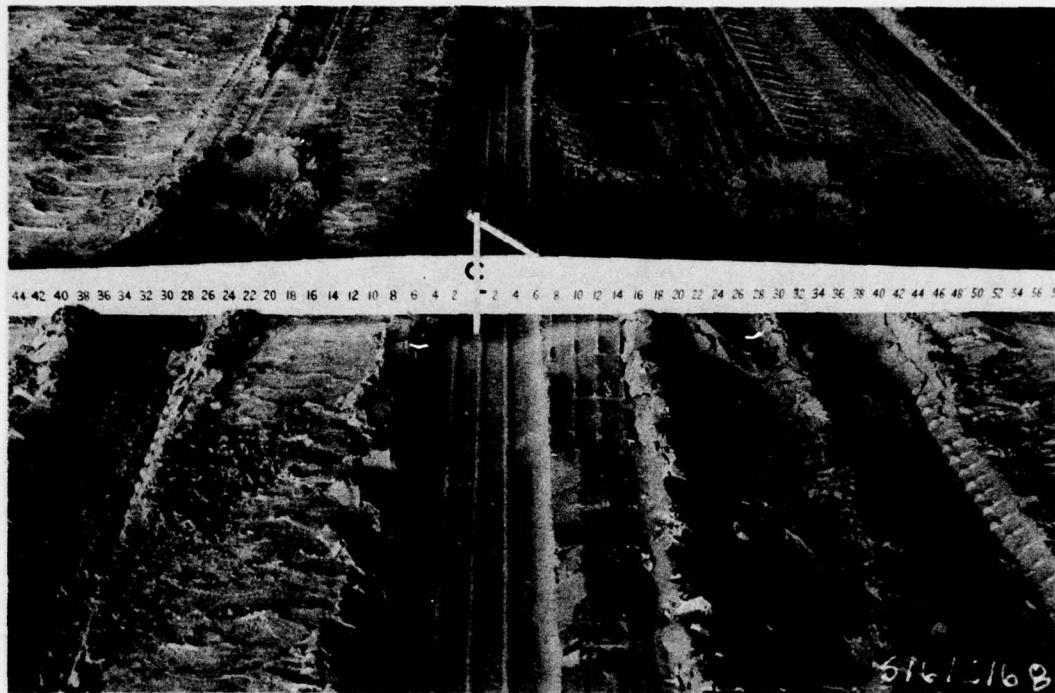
Rut in Test Section No. 5, item 2, after F-4C traffic
